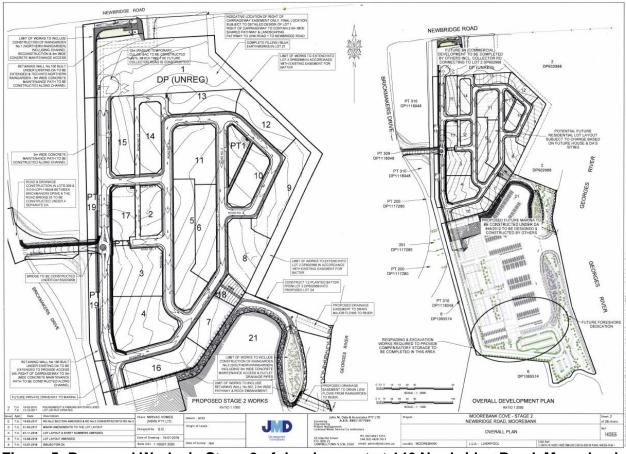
Proposed Works in Stage 2 of development at 146 Newbridge Road, Moorebank
